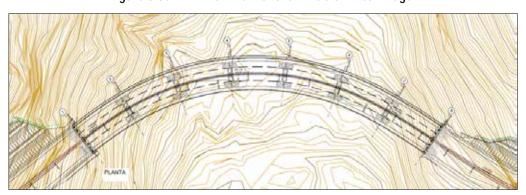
Plan view of the El Tablón Alto Bridge.
